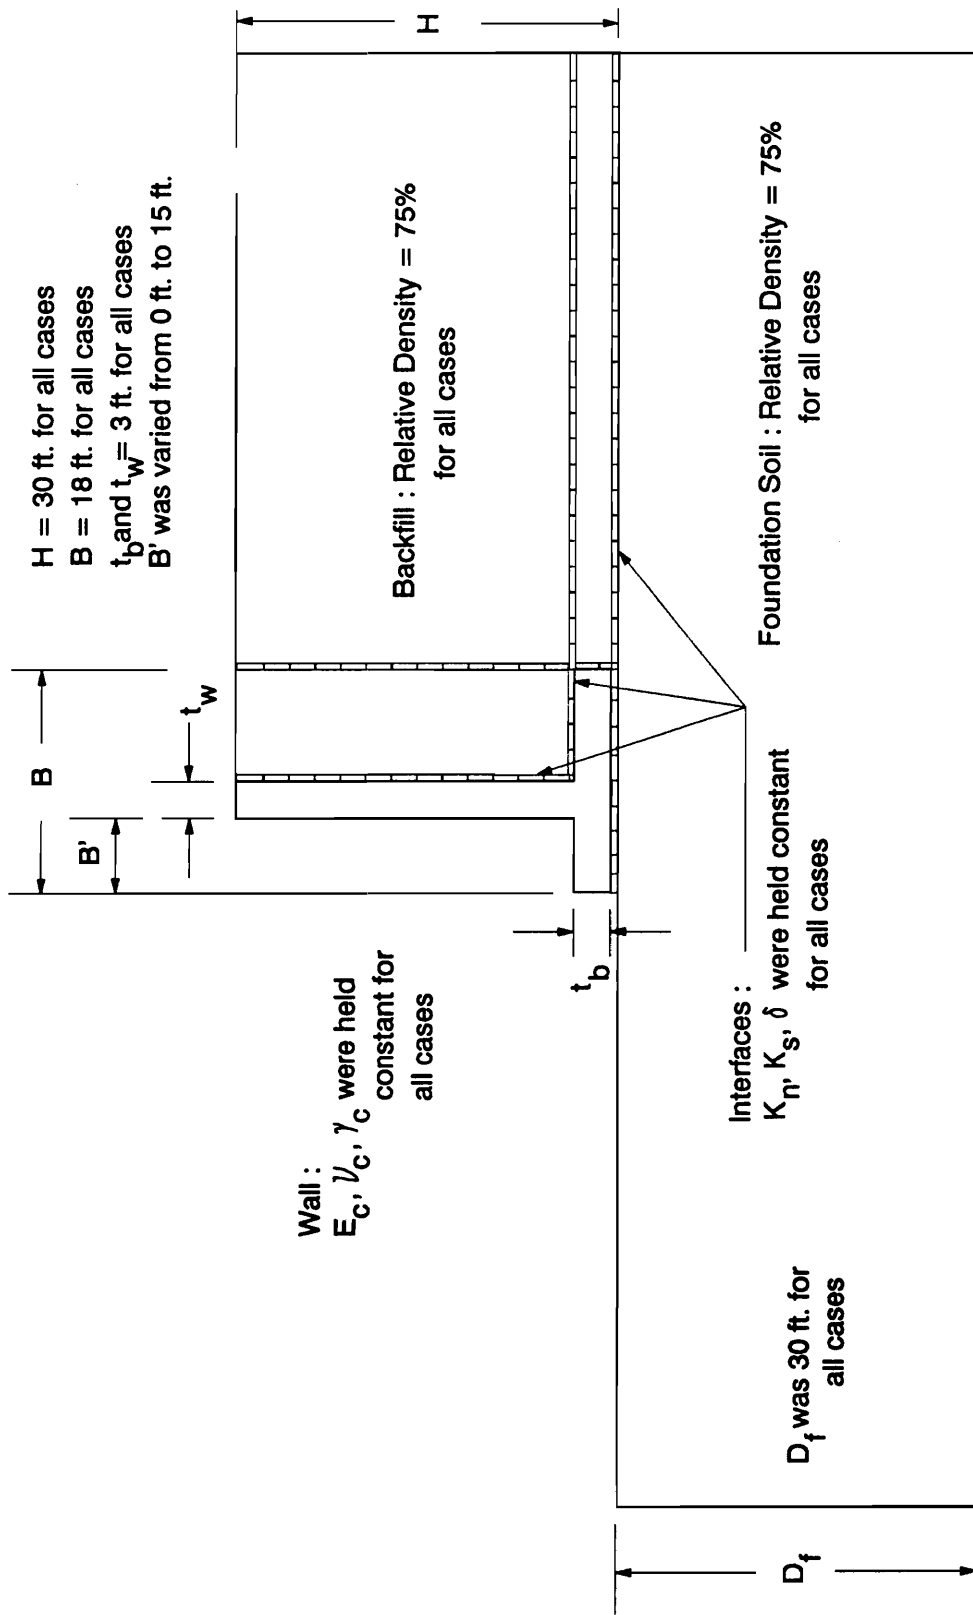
Hypothetical Wall-Foundation System used for Backfill Placement Analyses of Cantilever Retaining Walls
